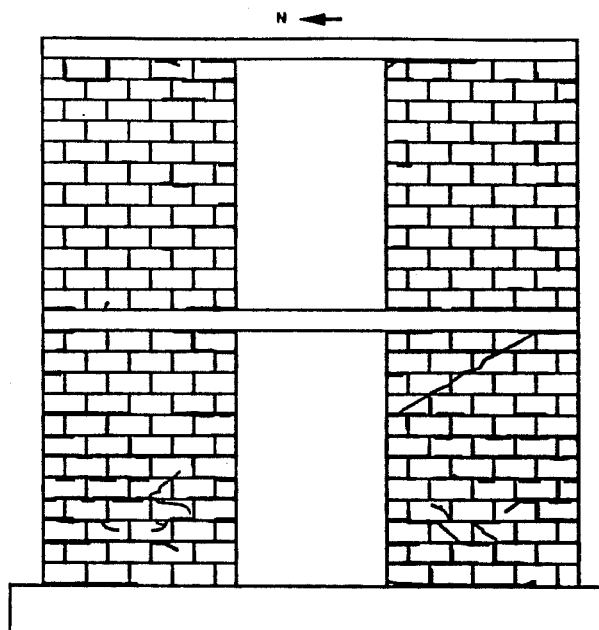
Sp. 2b: Progression of Wall Cracking at Load Point 141
